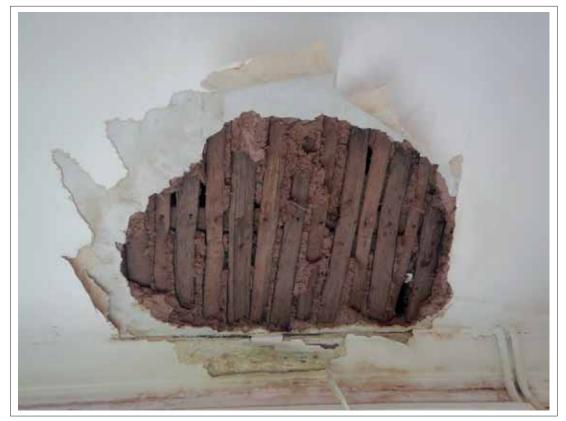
Damaged ceiling in Room 1.2, showing original ceiling construction.
